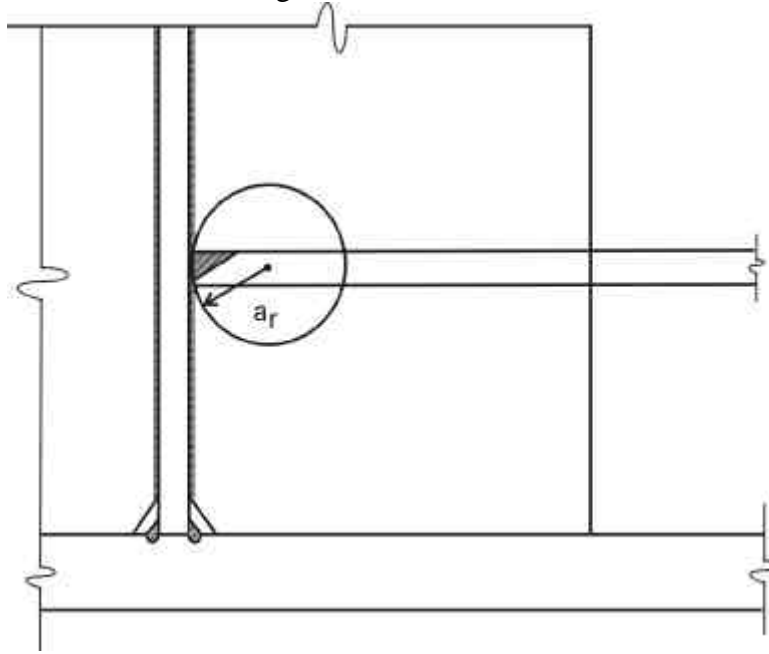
Geometric Condition Providing a Crack-Like Plane When Shelf Plate is Touching Transverse Connection Plate
